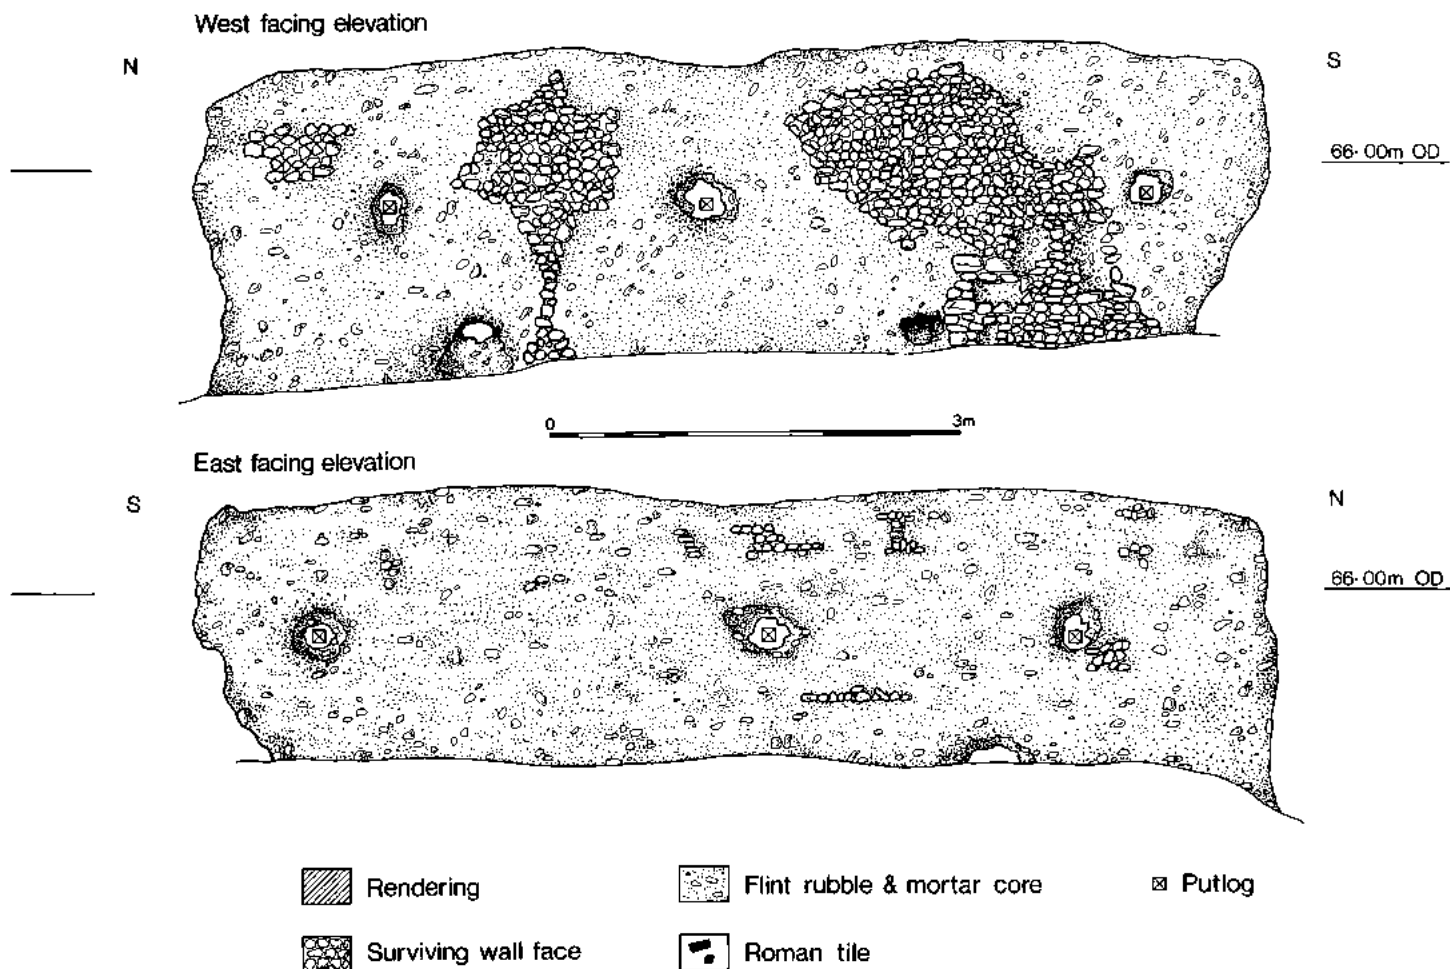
Tilty Abbey. East wall of west range; detailed elevation of northern section.
